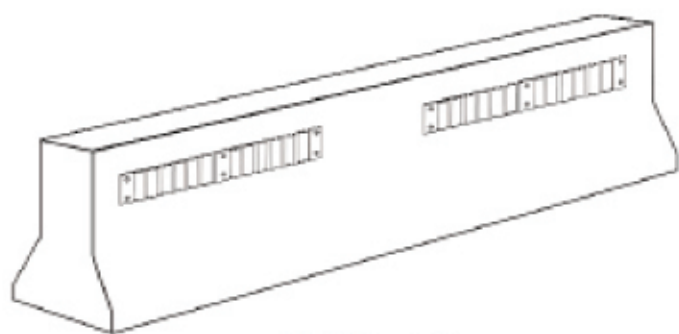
C: INSTALLATION – CONCRETE BARRIER
